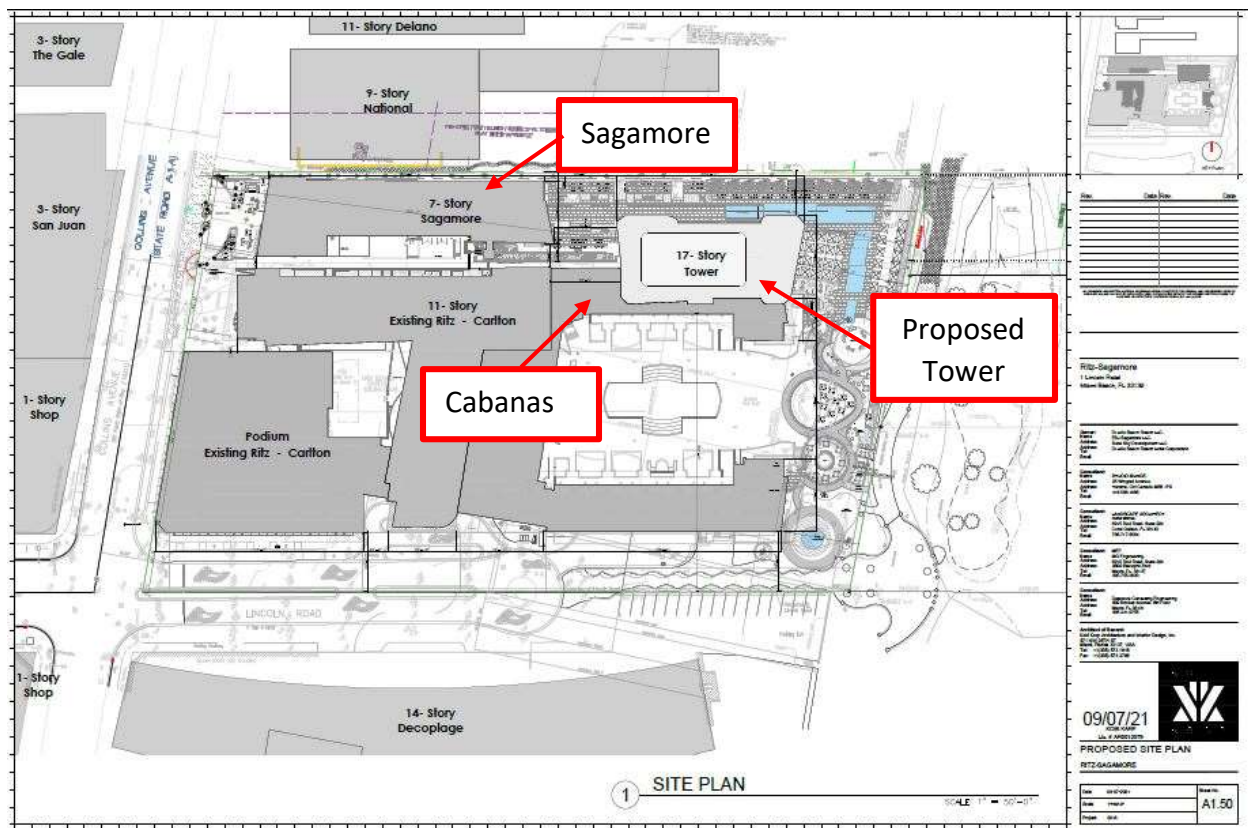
Proposed Site Plan for Ritz-Sagamore Project, 9/7/2021.
